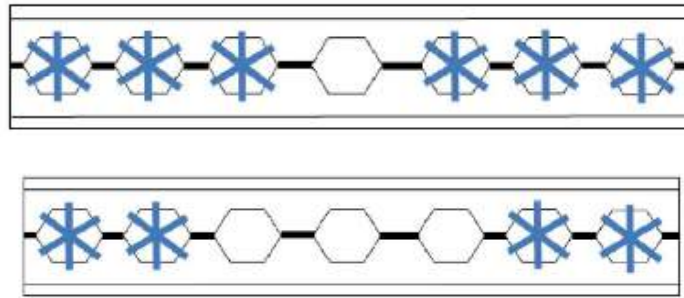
A-Stiffener in Two Adjacent Web Holes at Each End of The Beam Chassis Specimen, B- Stiffener in Three Consecutive Web Holes at Each End of The Beam Chassis Specimen
